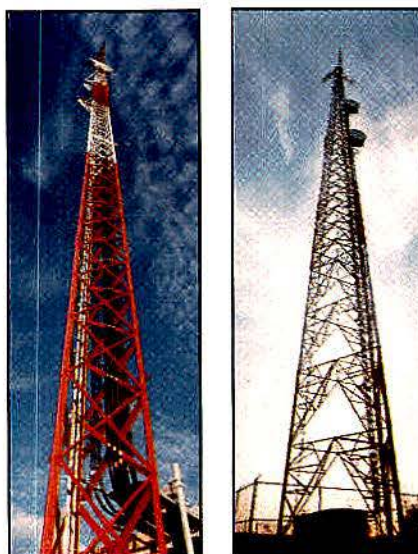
(left). All-bolted-construction, heavy-duty, guyed towers, such as this one with a 54-inch face width, can stand more than 550 feet high.
